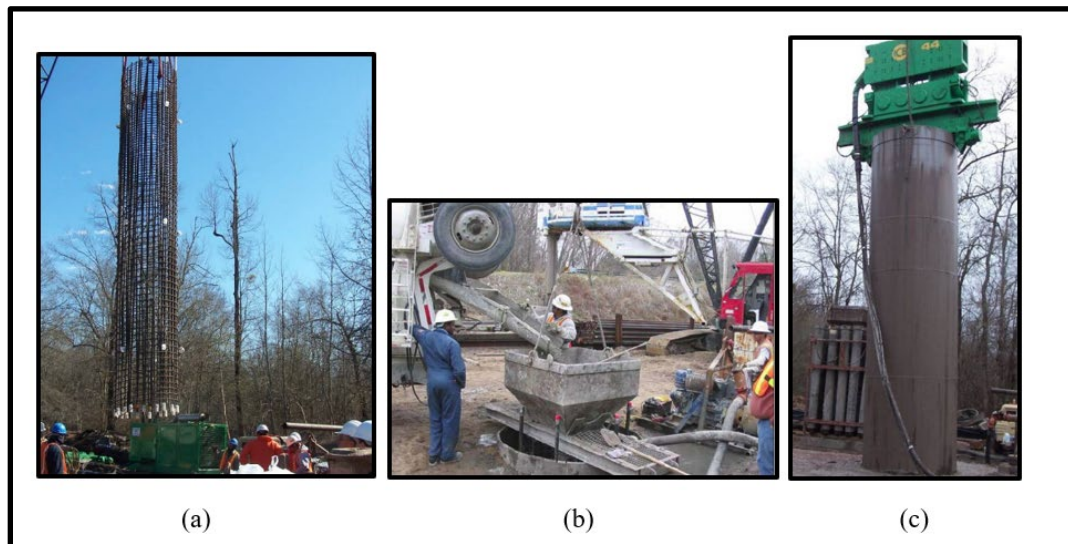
Construction process of drilled shaft; (a) Drilling and reinforcement casing; (b) Concrete pouring; (c) Removal of permanent casing [6]
